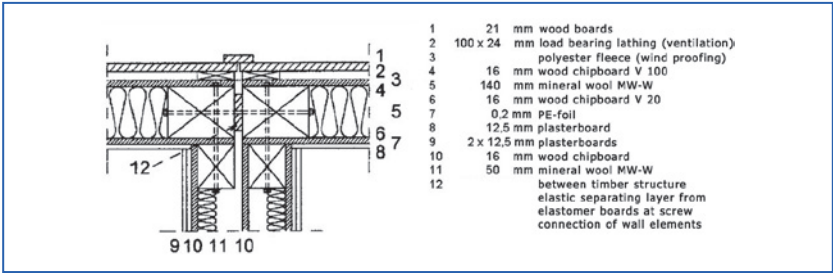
Connection between outer wall and wall separating flats (horizontal section) [[2] - (Austria)].
